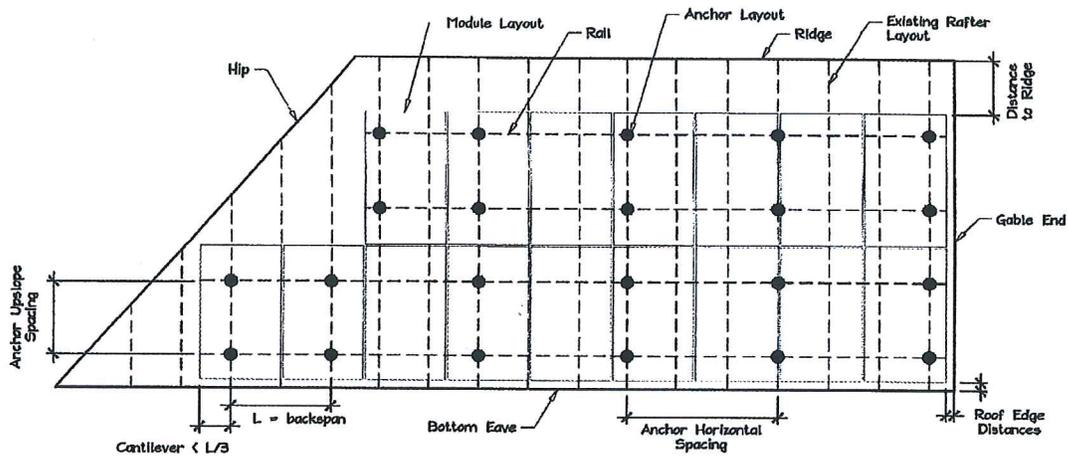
Sample Solar Panel Array and Anchor Layout Diagram (Roof Plan).
